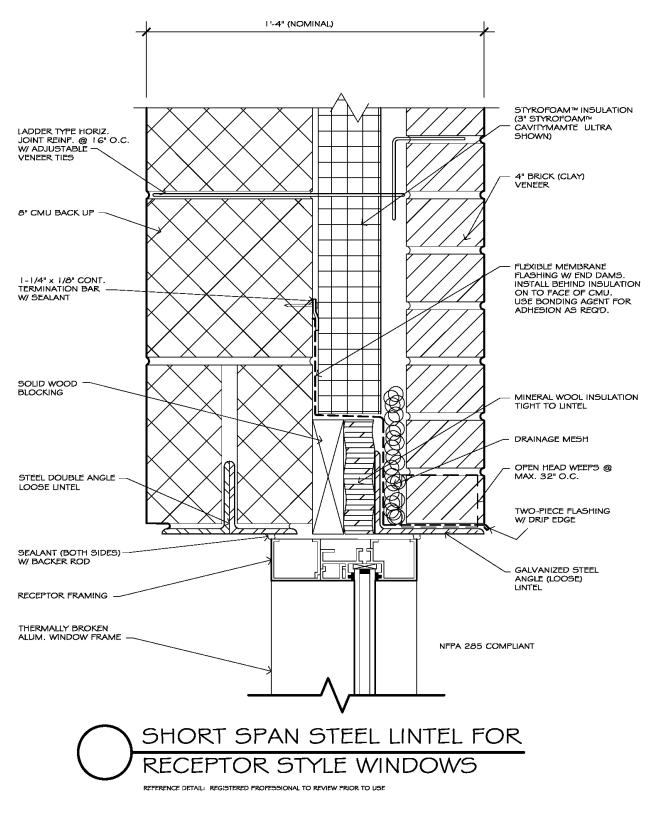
Window / Door Opening Detail w/Mineral Wool & Fire Treated Wood Blocking
